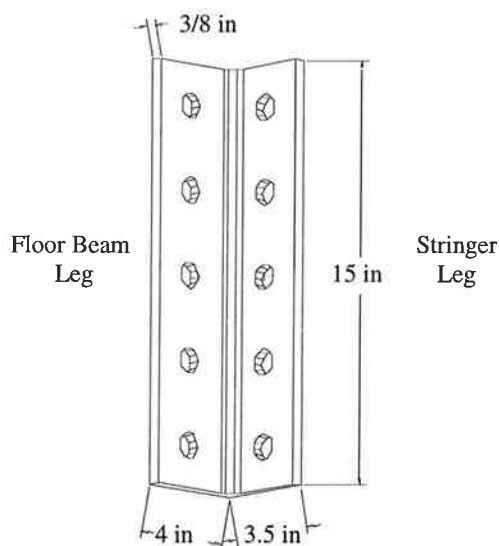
Clip angle used in the stringer to floor beam assemblies on the Winchester Bridge.
